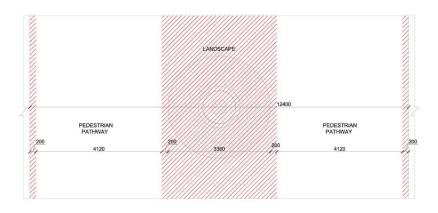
Street width and buffer spaces (in mm) for Gateway 6 in the area surrounding Hauptwache in Frankfurt am Main
